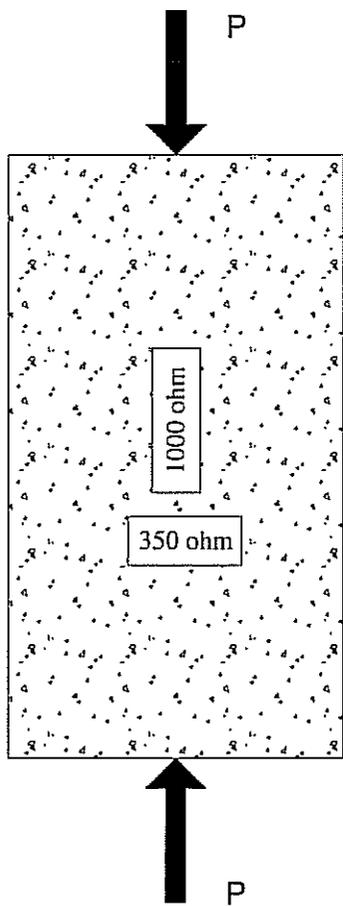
(a). Axial Compression Test Specimen with Strain Gages.
